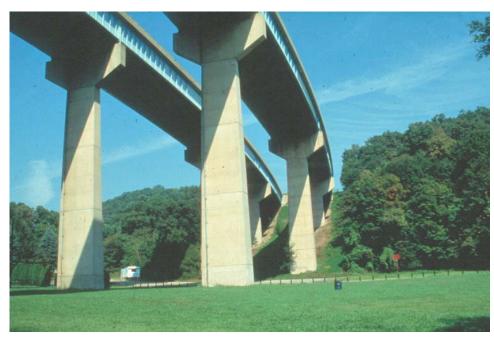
Example of Piers as Intermediate Supports for a Bridge
